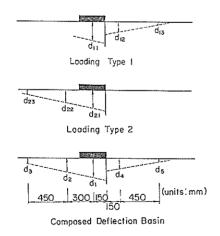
Measurement of FWD at Joint for Detecting Void under Concrete Slab
